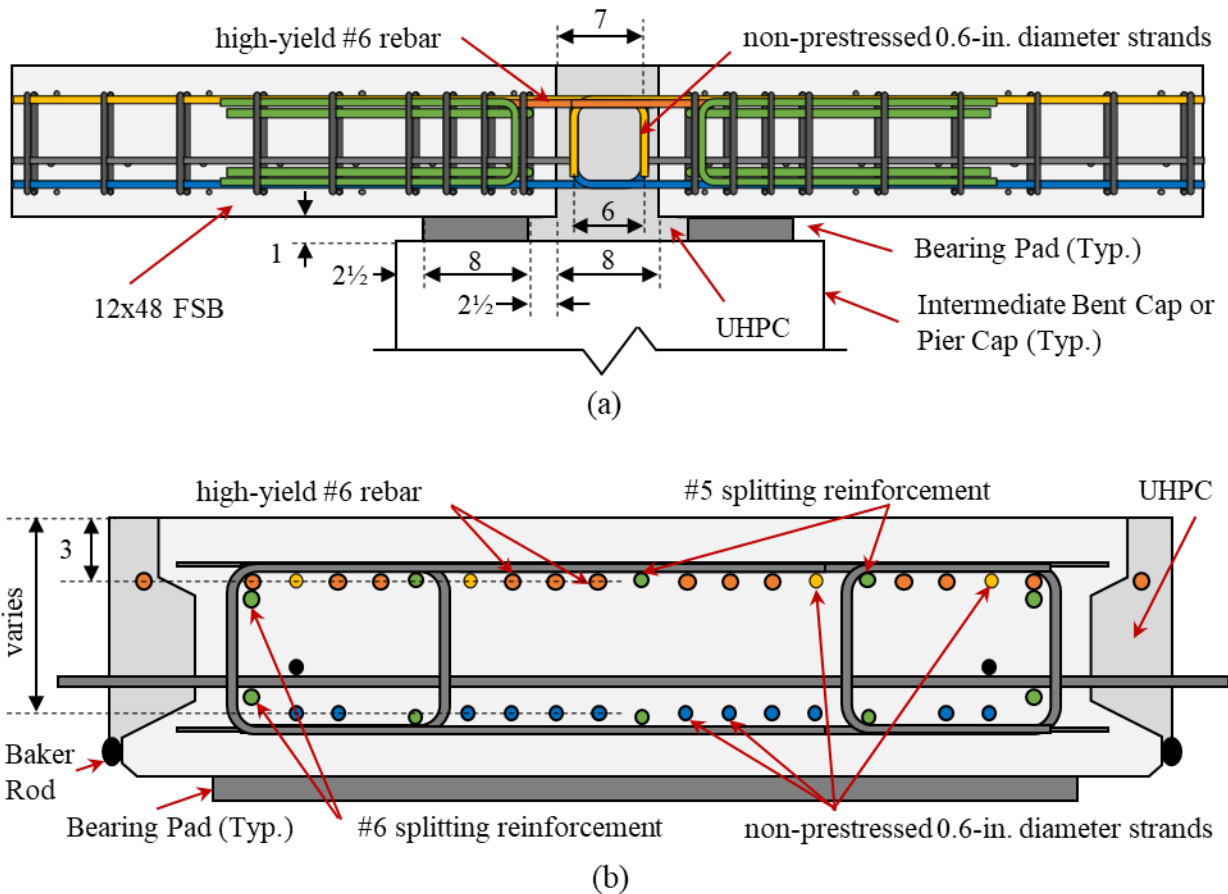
Proposed SDCL connection for modified FSB system: (a) section through diaphragm connection and (b) FSB end region reinforcement detail. Note: units in inches
